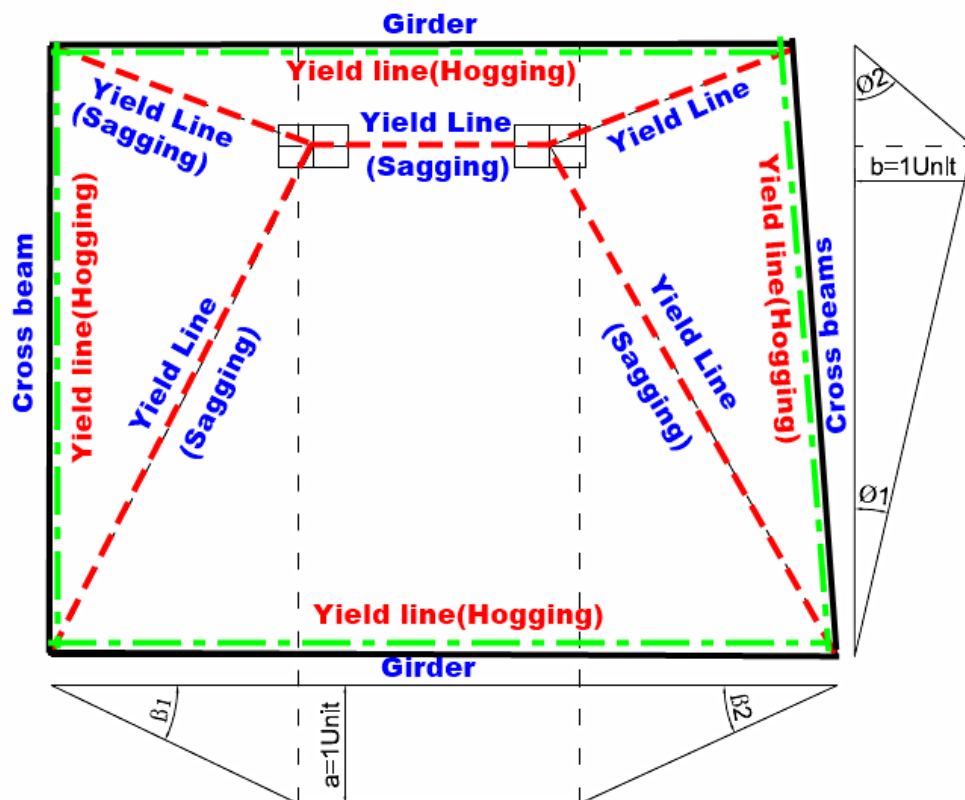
Yield line model used for bending capacity. The figure shows the loaded part of the bridge deck slab between longitudinal and transversal beams. Yield lines were assumed according to the figure.
